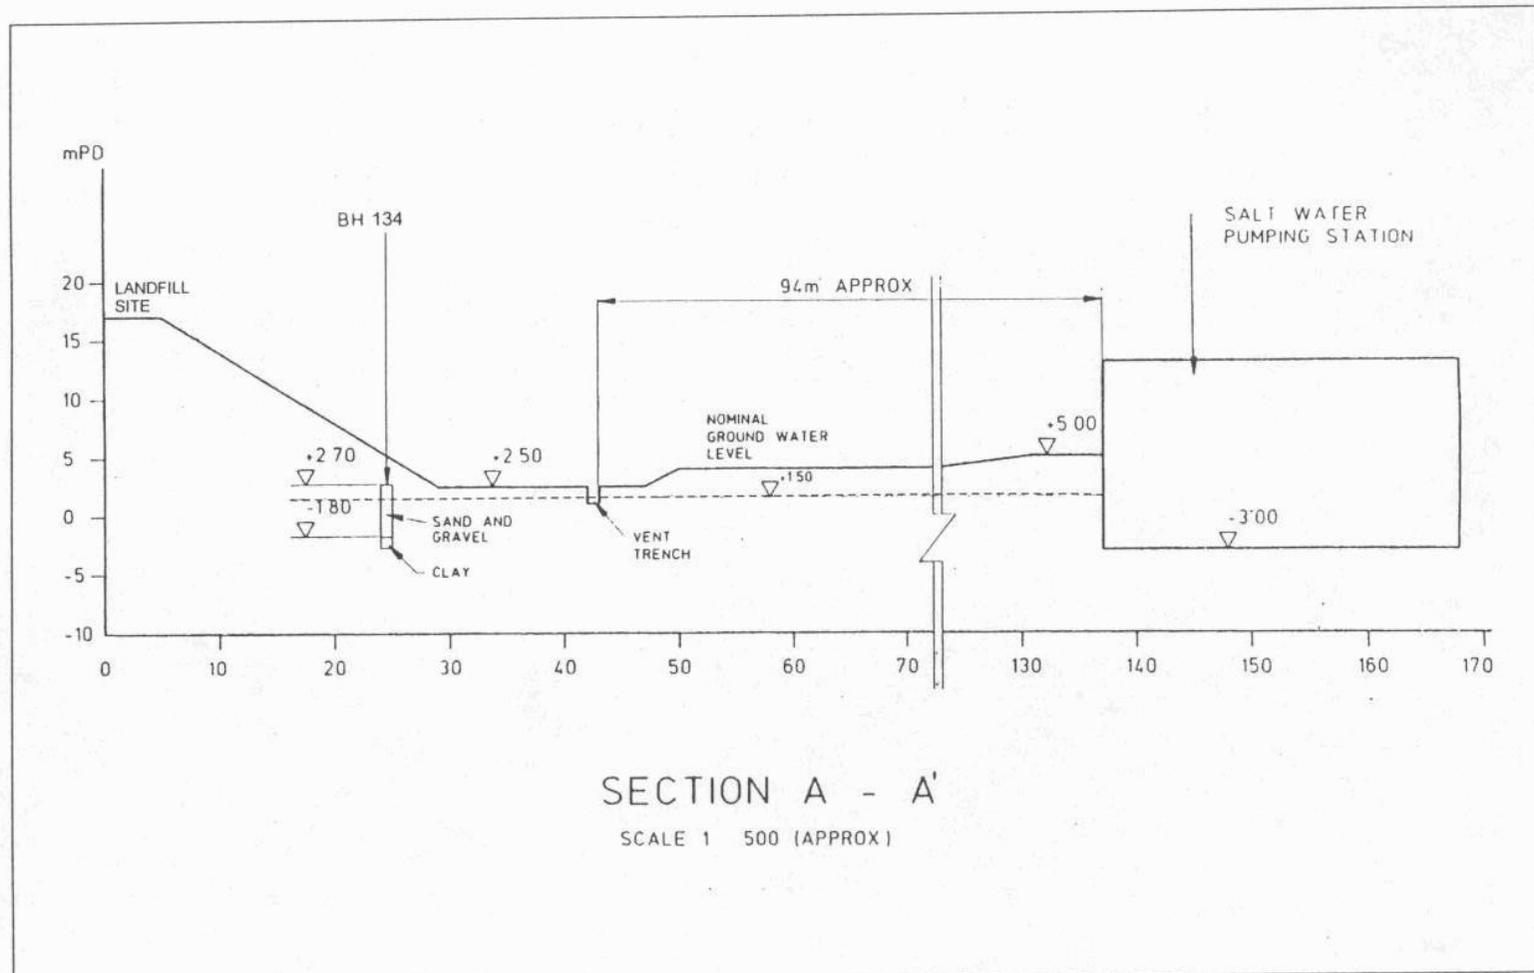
CROSS SECTION THROUGH SALTWATER PUMPING STATION AND LANDFILL
